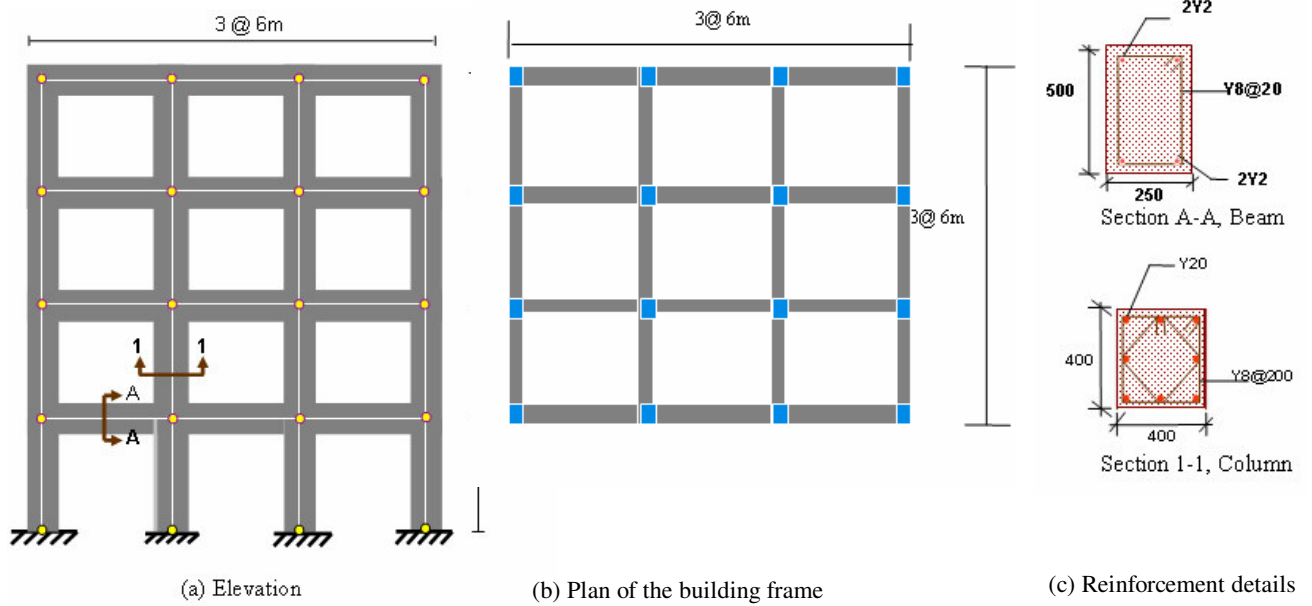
(a) Elevation, (b) Plan of the Building frame (C) reinforcement details of Columns and beams
